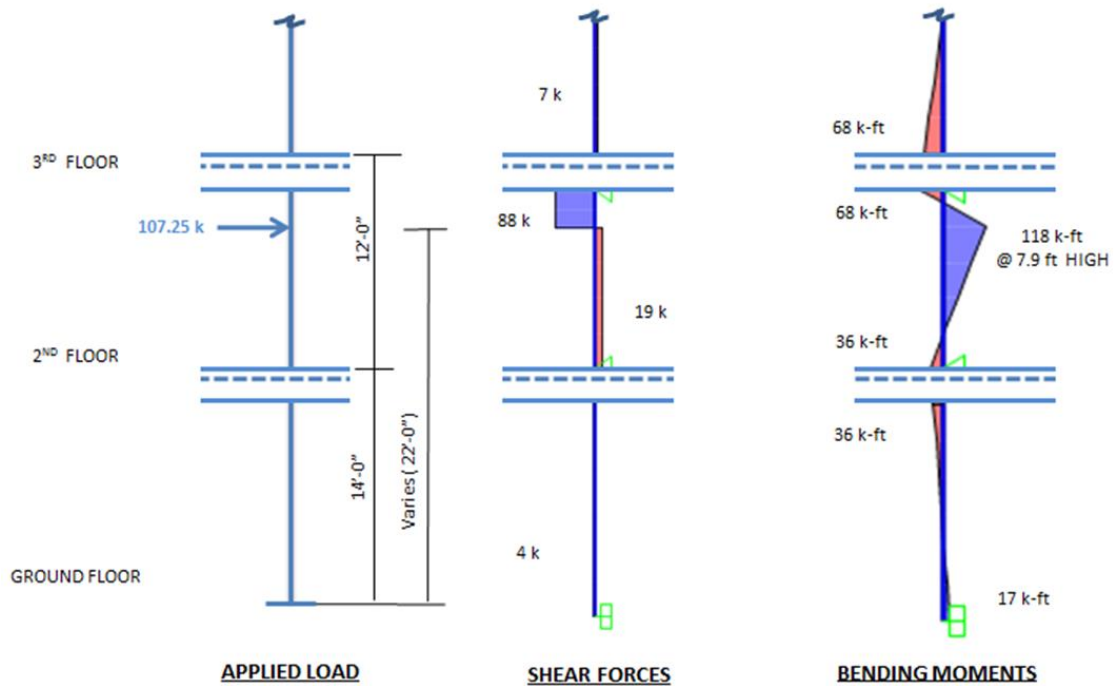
Impact load applied at "d" away from the end of column on the 2nd floor
